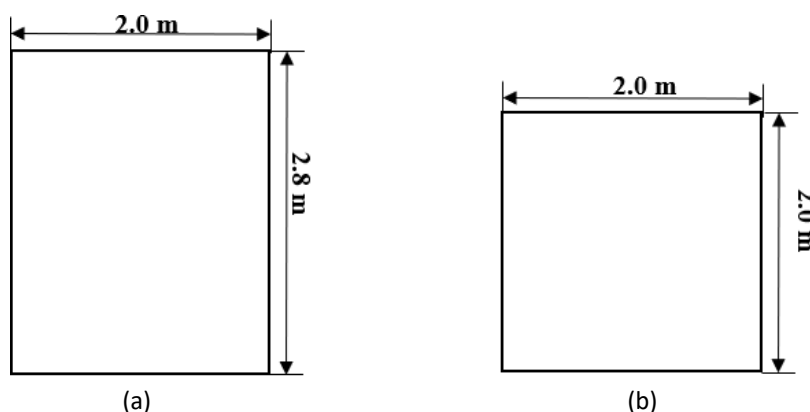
(a) Side view of elevator (b) Top view of elevator
